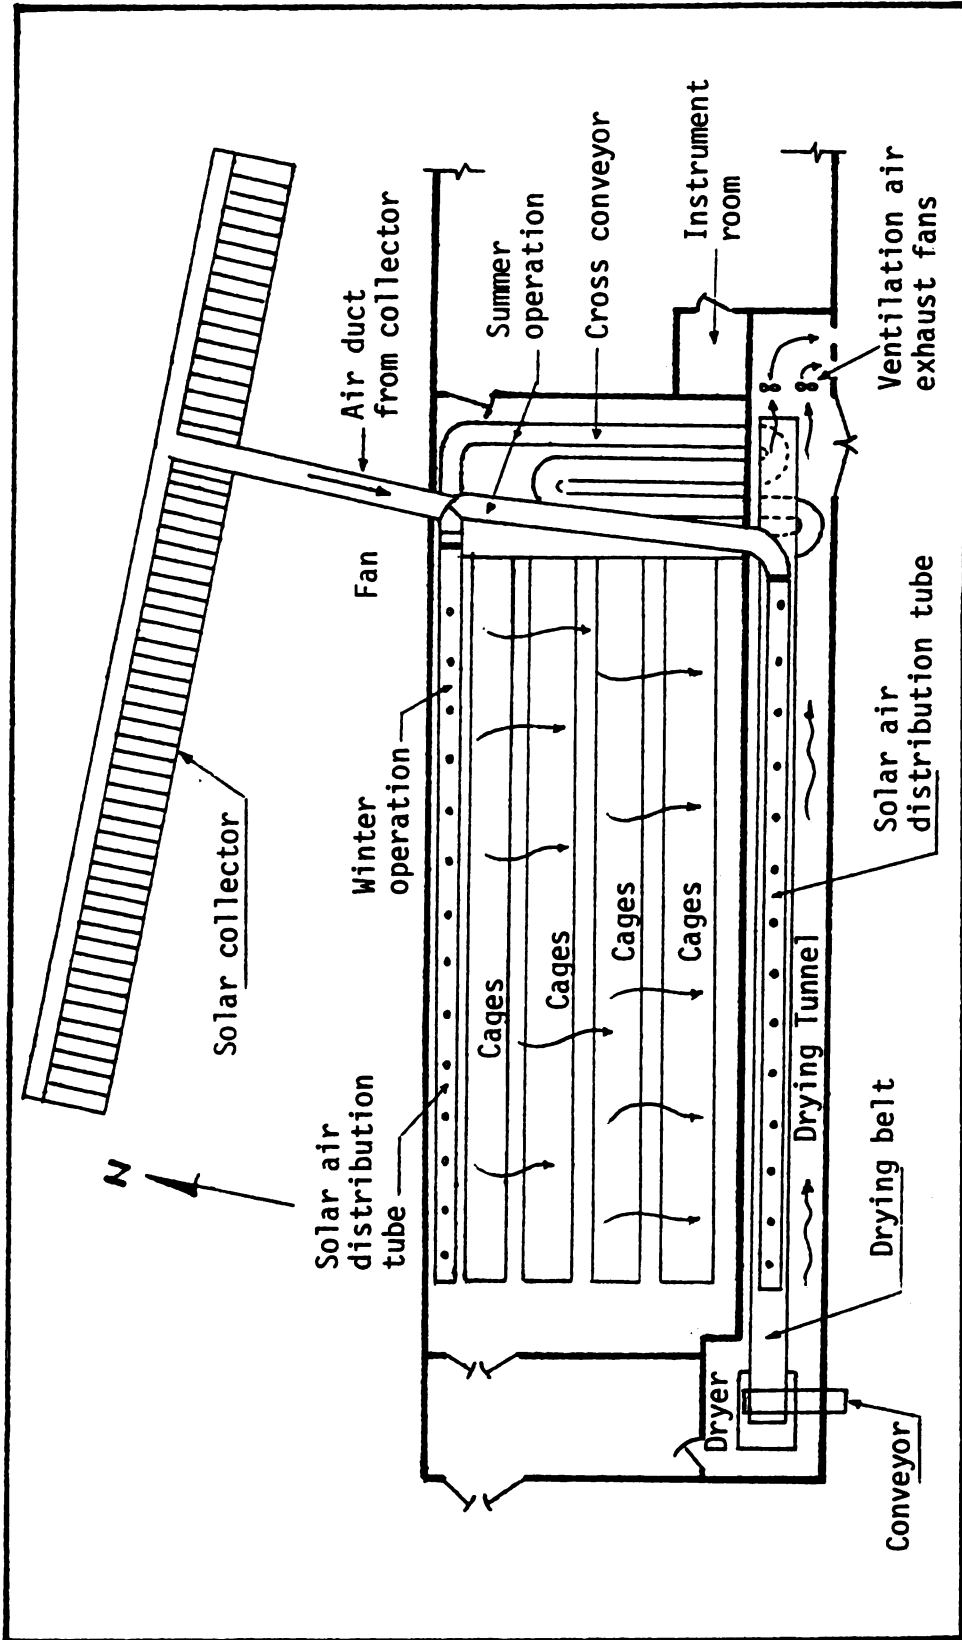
A schematic plan of a 5,000 bird laying house with a solar collector for supplemental heating and excreta drying.
